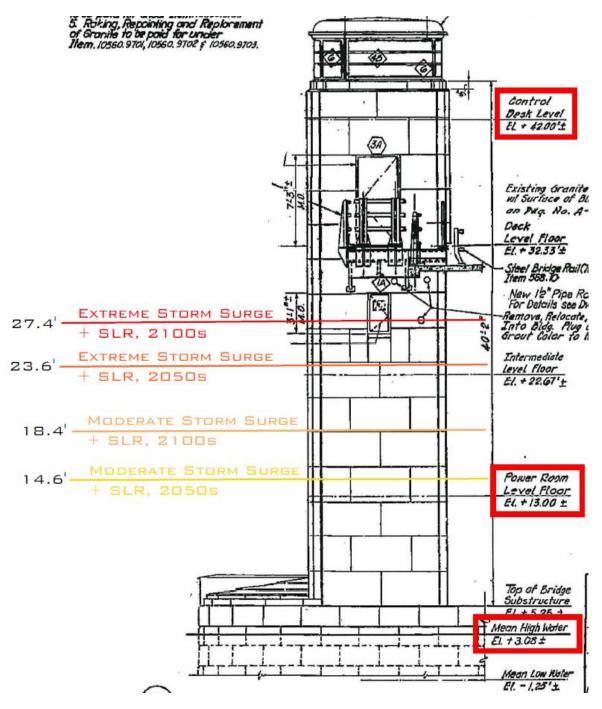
SANDY LOOP PARKWAY BRIDGE BASCULE PIER STRUCTURE ELEVATIONS RELATIVE TO WATER SURFACE ELEVATIONS.
